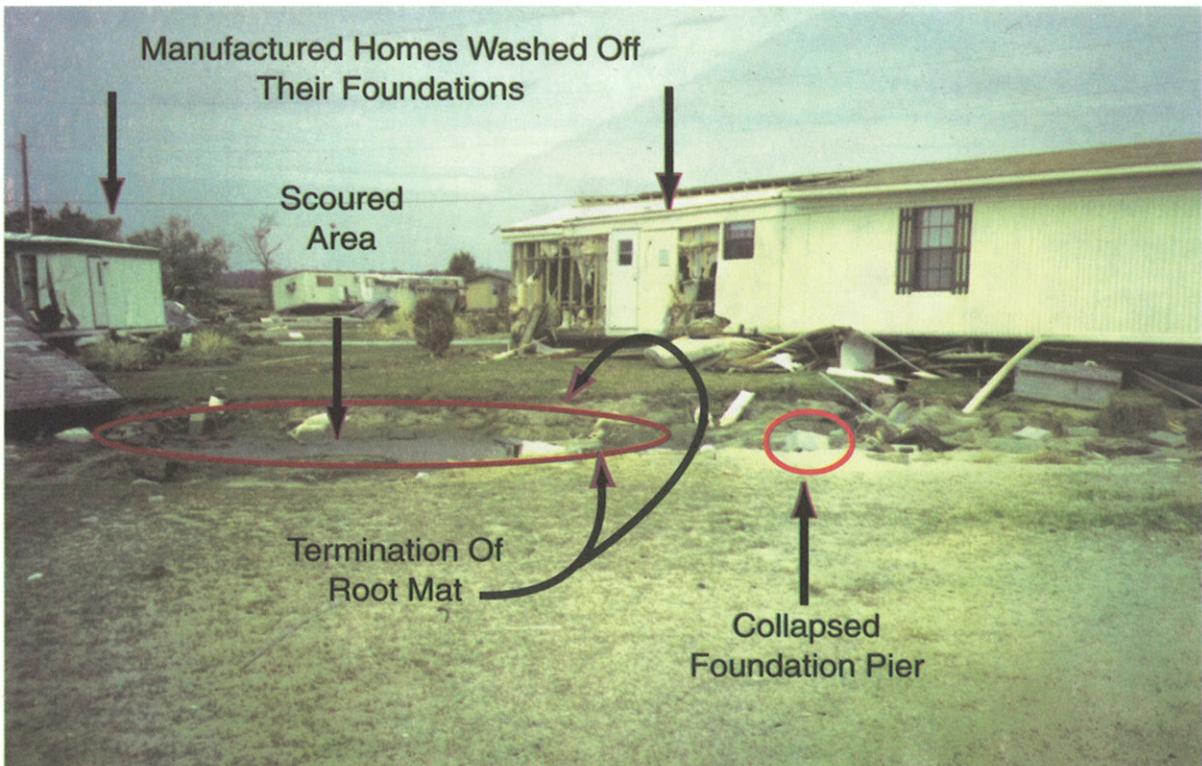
Localized scour beneath pre-storm footprint of manufactured home. Note the collapsed dry-stack block foundation and termination of root mat, which otherwise would have helped stabilize the adjacent ground.
